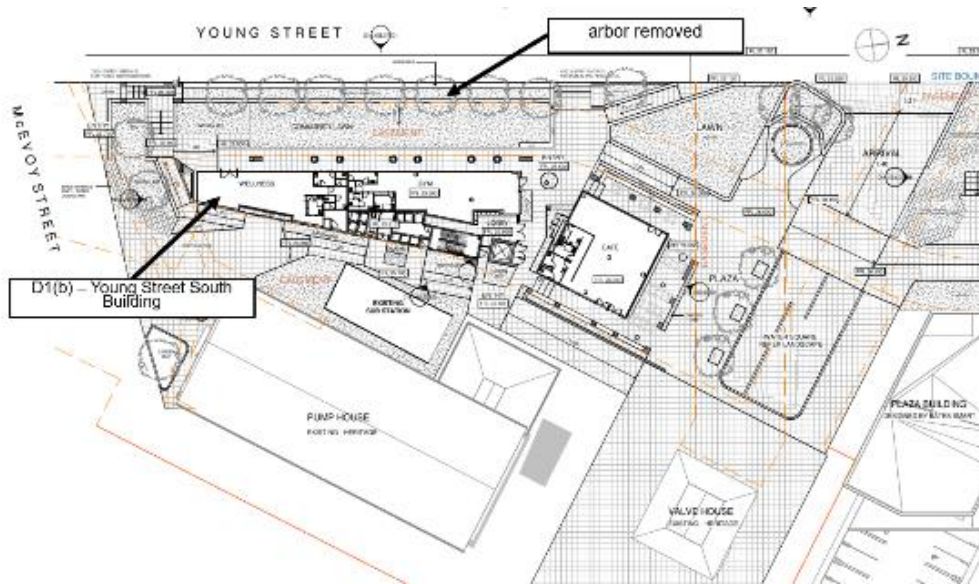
Site plan lodged with the development application, showing the majority of the arbor west of Young Street South Building removed and replaced with canopy tree plantings
